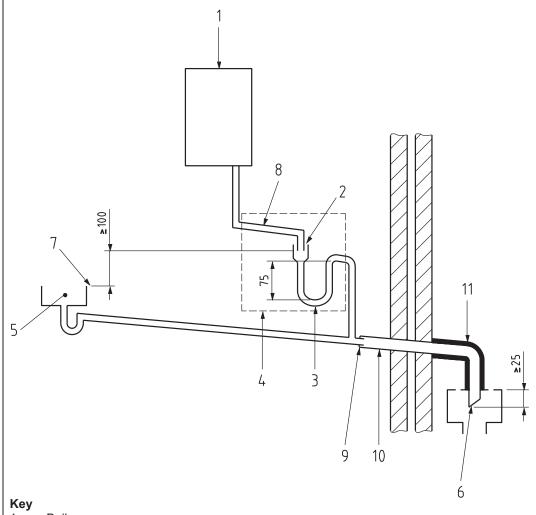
(a) – Connection of a condensate drainage pipe downstream of a sink, basin, bath or shower waste trap
